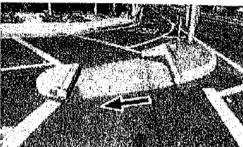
Intersection of Adams Avenue & Fairview: Center median to be reduced, and location of new bike lane (beginning and end) at the crosswalk adjacent to the existing porkchop islands
